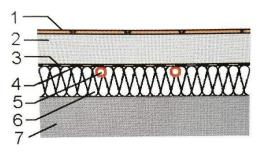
TYPE B system with pipes built into the thermal insulation layer: 1= floor covering, 2= carrier and heat distribution layer, 3= protective layer, 4= Waterproof layer, 5 =heating/ cooling pipes, 6= insulating layer, 7 =floor construction (2, 3)
